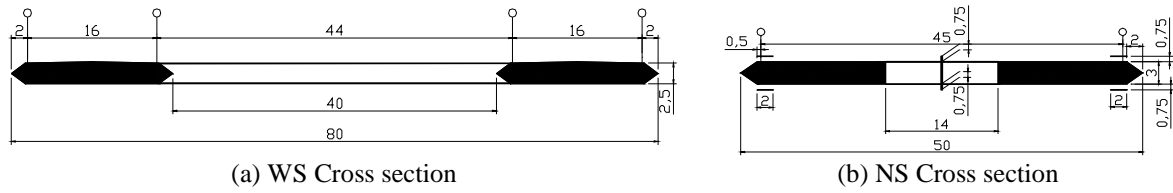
Geometry of deck sections of WS and NS (Unit: m)
